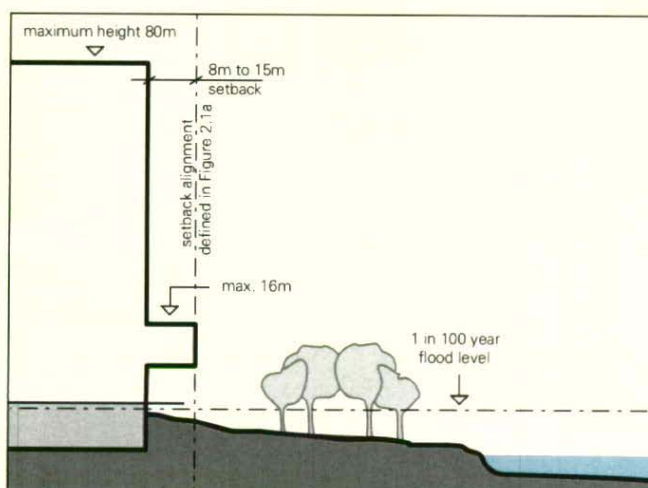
River Foreshore Edge Condition. New development should be built to the alignment defined for the river foreshore to a maximum of 16m. Above 16m development must be set back between 8 and 15 metres
